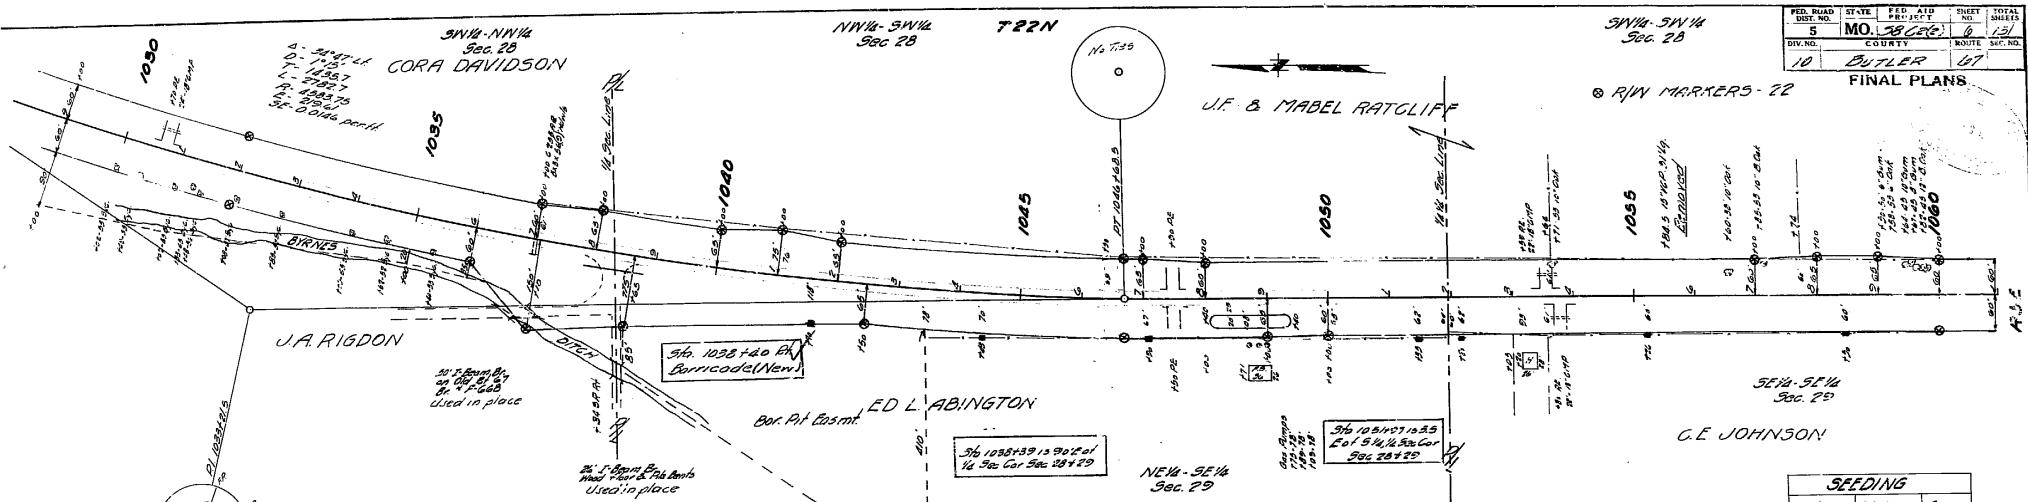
PLAN - PROFILE OF ROAD STANDARD
